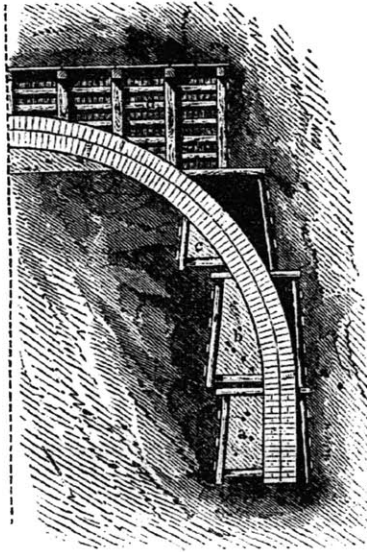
Illustration of the construction process of the Tronquoy tunnel (Sandström, 1963)
